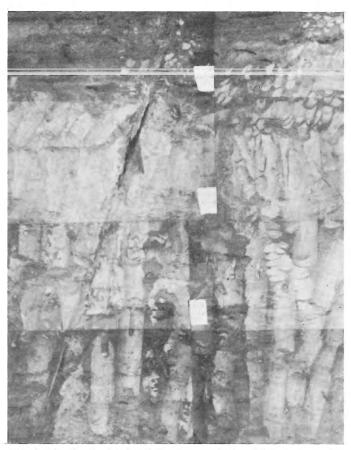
Mosaic showing fault plane at Station 0+16 in Excavation No. 9, a point directly beneath south toe of main dam. Fault is partially filled with loose silt. A cavity appears in upper half of photo.
